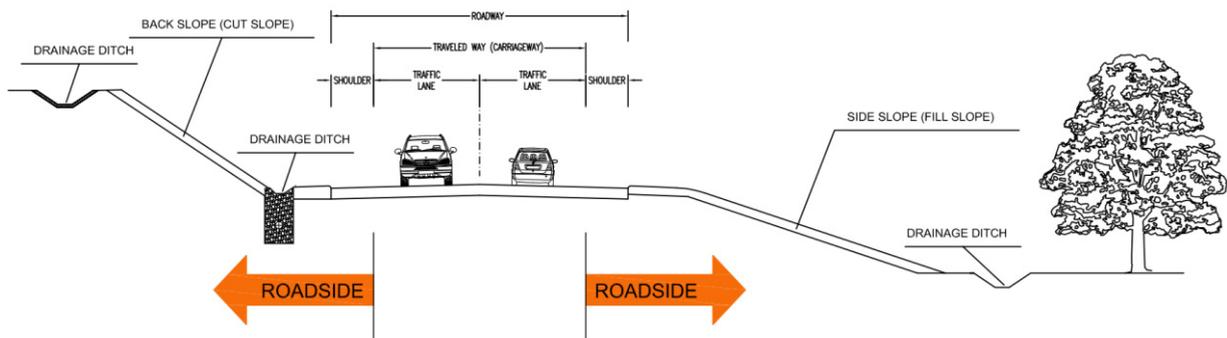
Roadway cross section with examples for roadsides with clear zones
